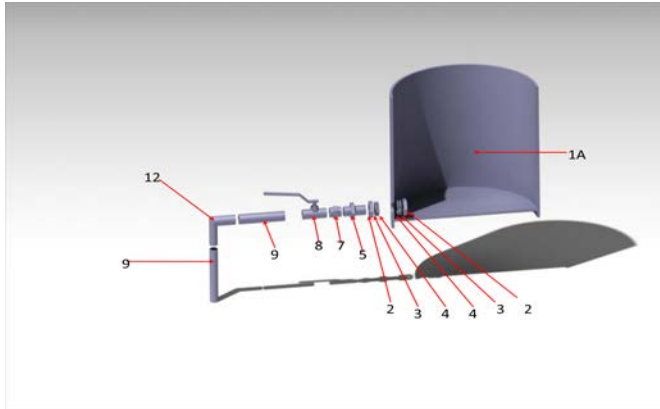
Schematic pipe line connection from UVO reservoir to mixing tank
